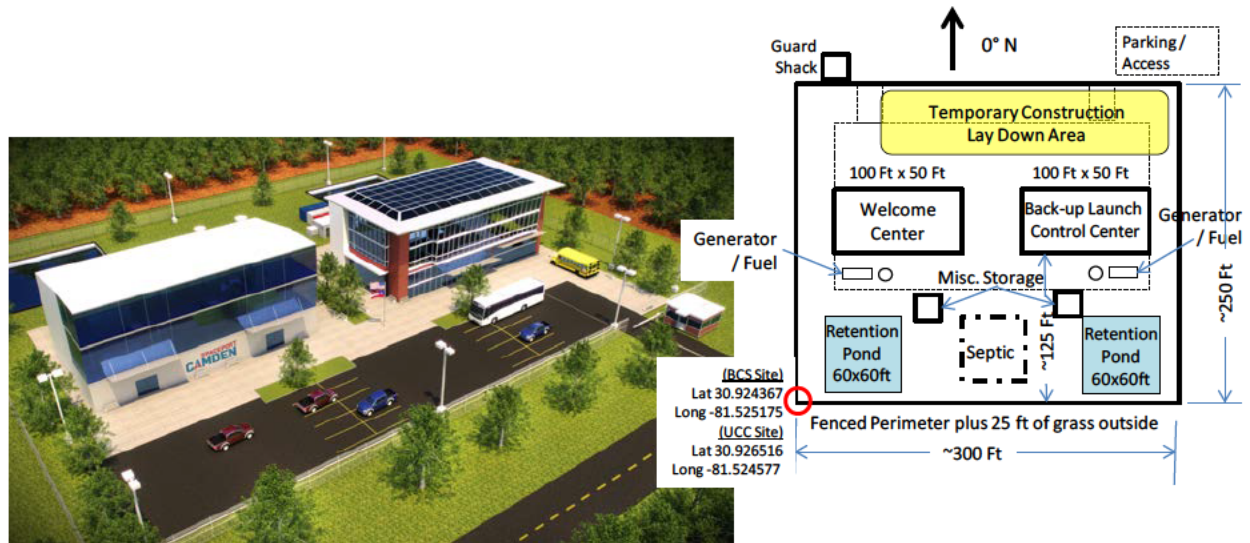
Alternate Control Center and Visitor Center (artist concept and layout schematic).
